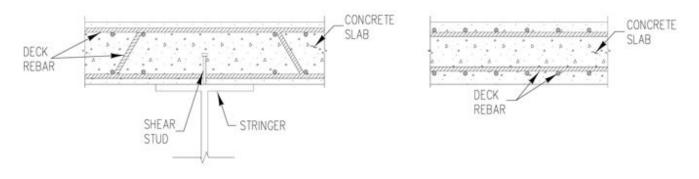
Lightweight Reinforced Concrete Deck Cross Sections
